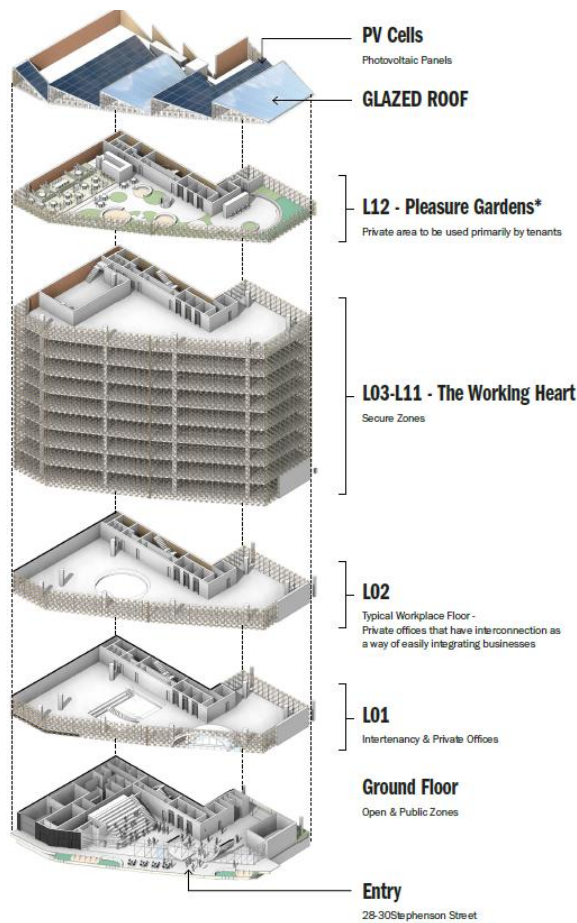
Concept axonometric diagram of the proposed building floor-by-floor (Source: Urban Context Report, pg 34)
